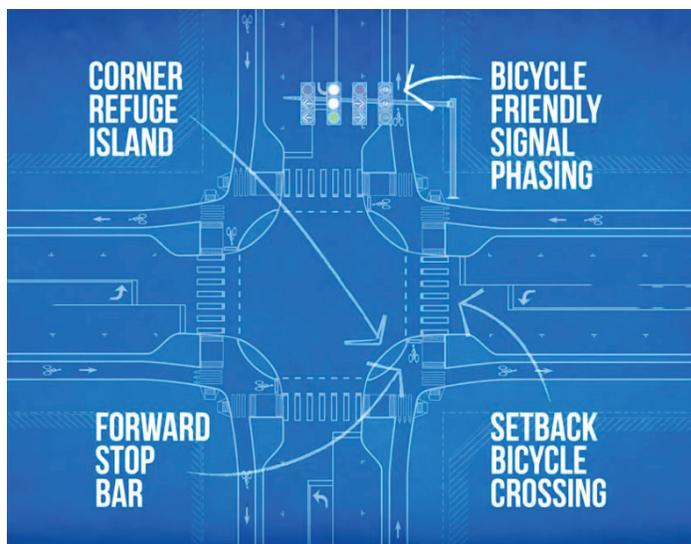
Design elements of protected intersections (Photo Credit: Alta Planning)
